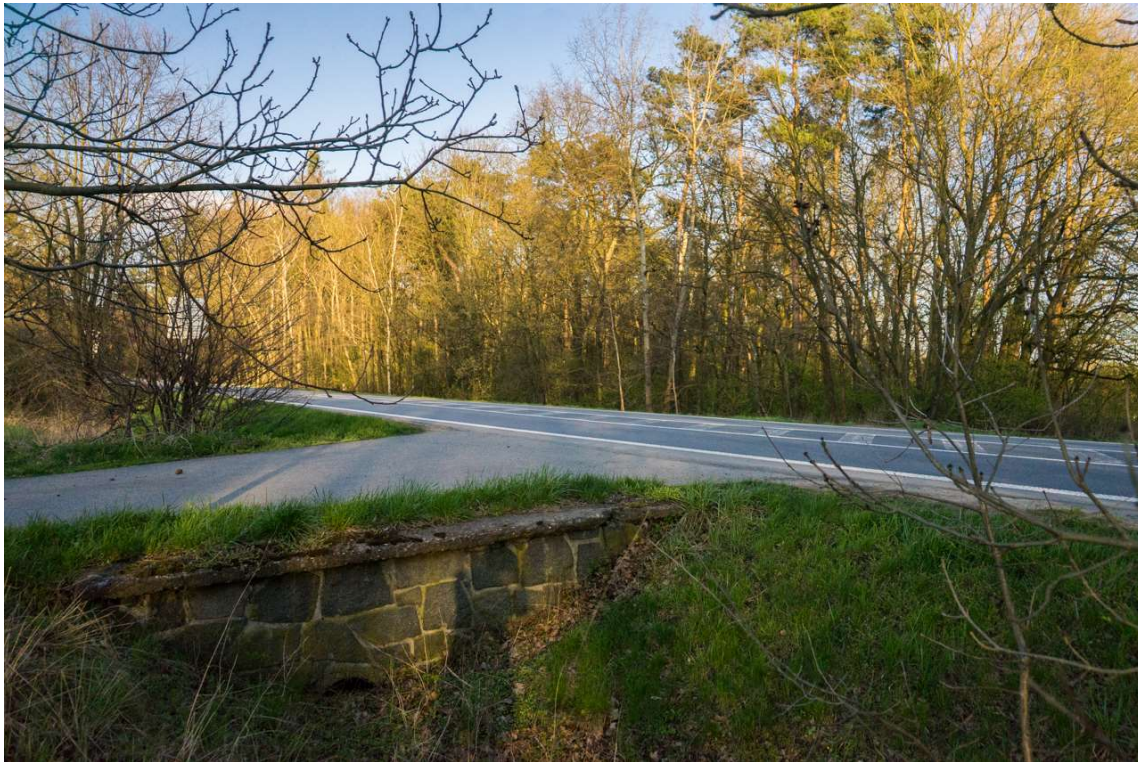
site on the I/2 road, where a subway for the proposed C line would be located.
